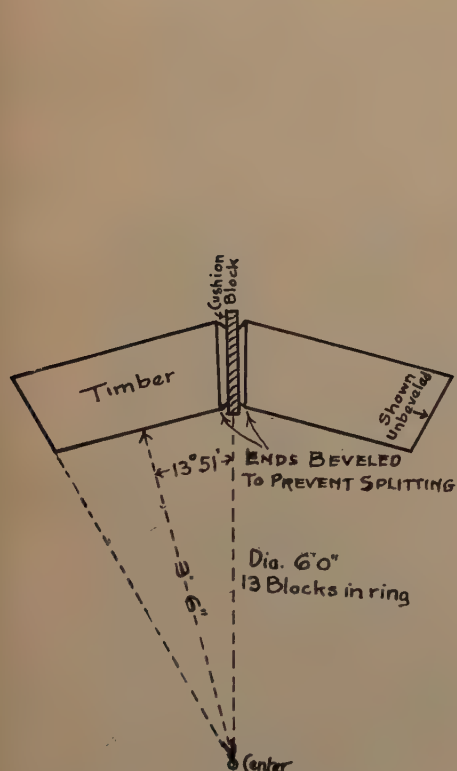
LAYOUT OF TIMBER BLOCKS FOR 6 FT 0 IN. DIAM GALLERY.
